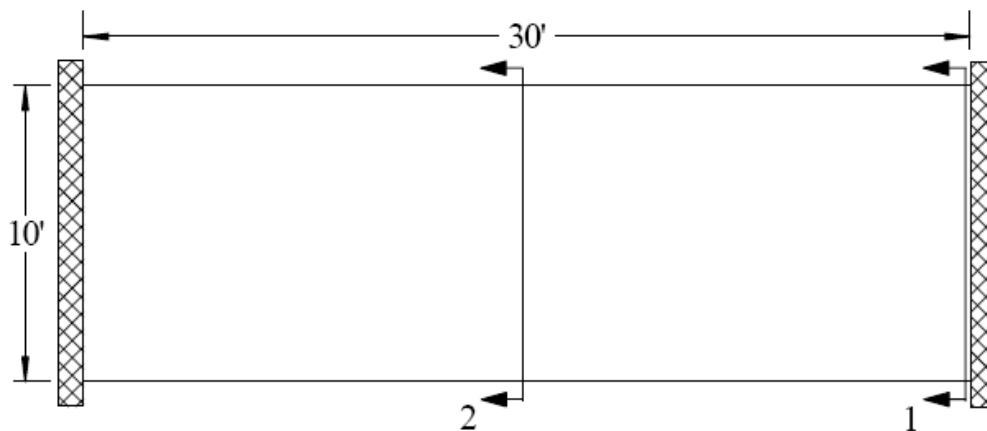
Example Flat Plate Structure (PLAN)
